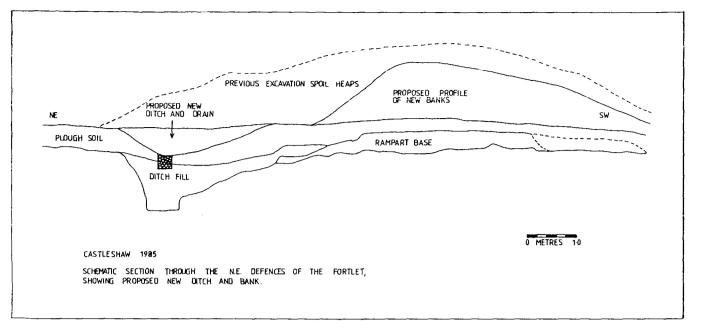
Castleshaw : proposed reconstruction of fortlet defences
